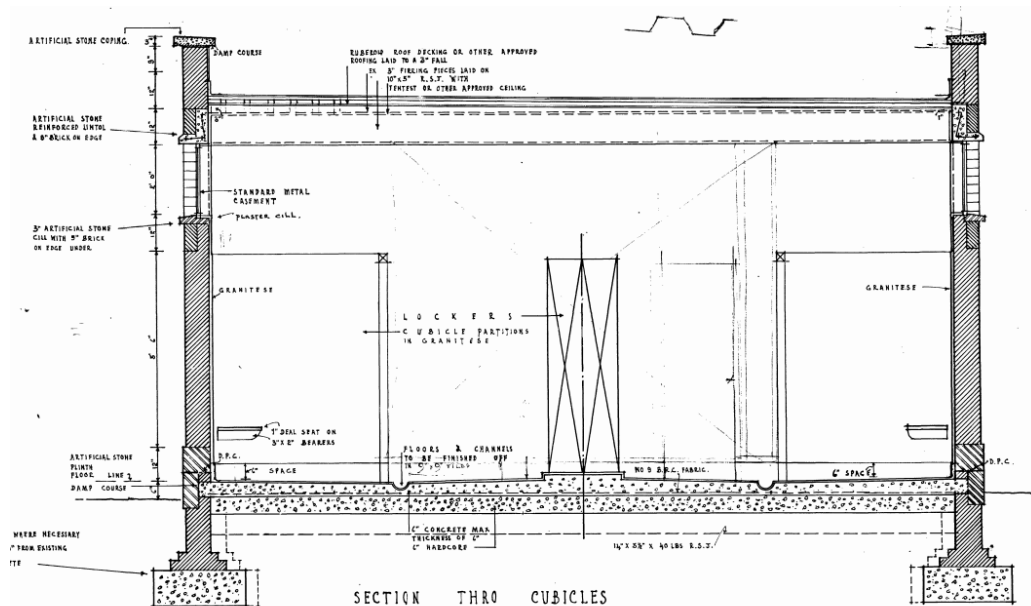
Section Through Original Structure (From Drawing No. 10)
